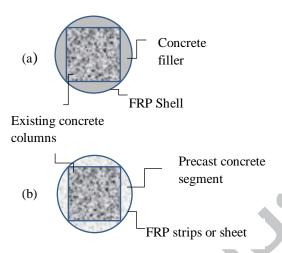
Modification methods of non-circular sections (a) using prefabricated FRP shell and (b) using precast concrete segment.
